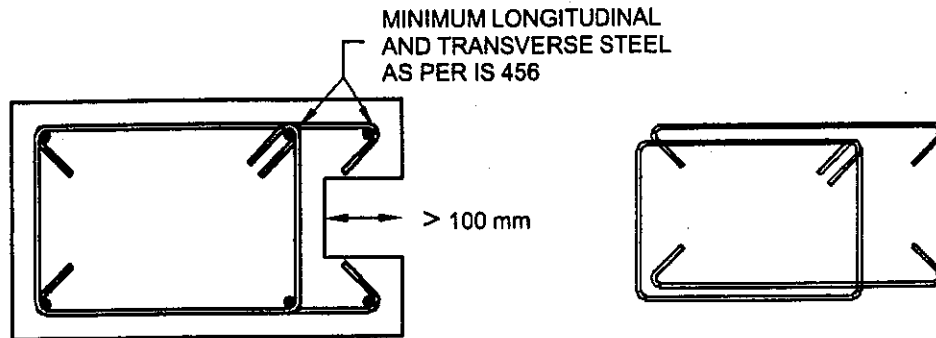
REINFORCEMENT REQUIREMENT IN COLUMNS WITH PROJECTION MORE THAN 100 MM BEYOND CORE
